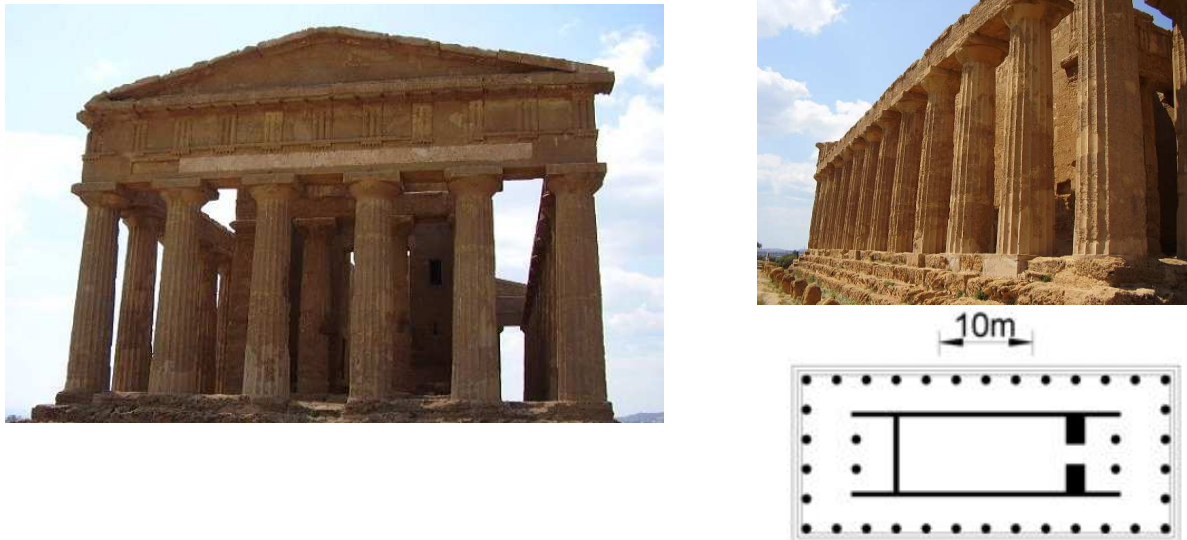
Est façade, North colonnade and plan of the Concordia Temple
